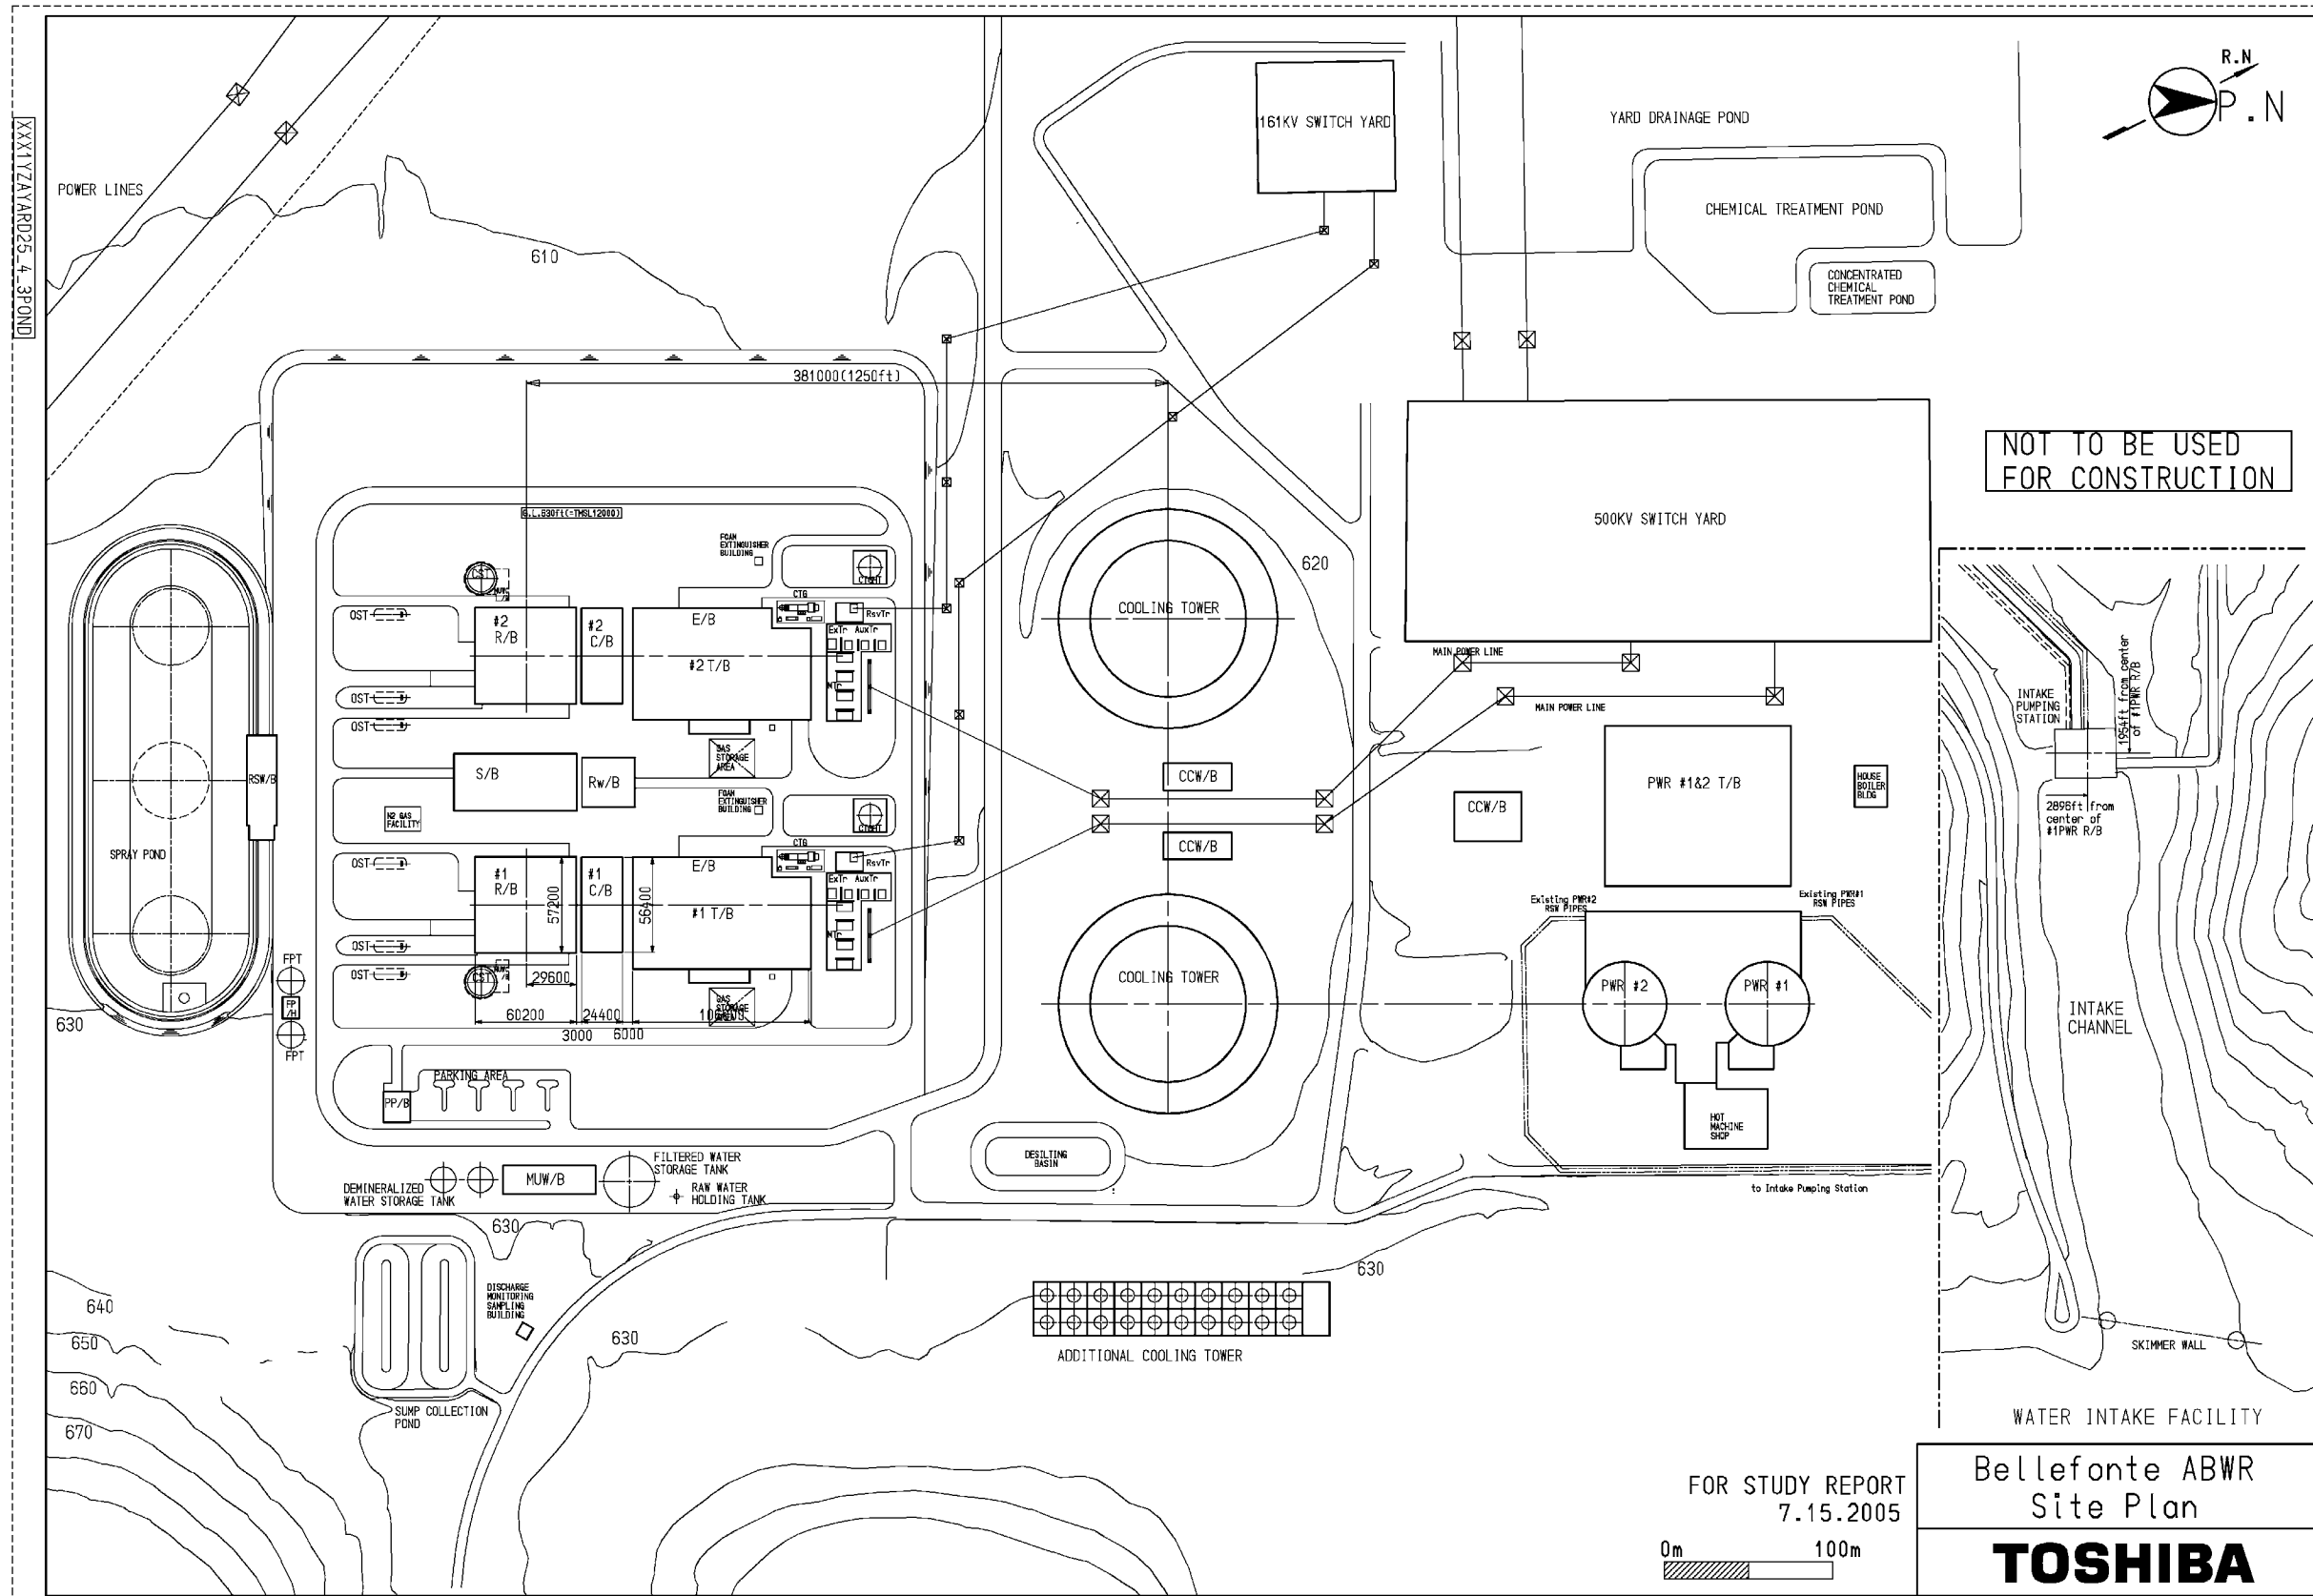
Preliminary Plot Plan for Bellefonte ABWR
